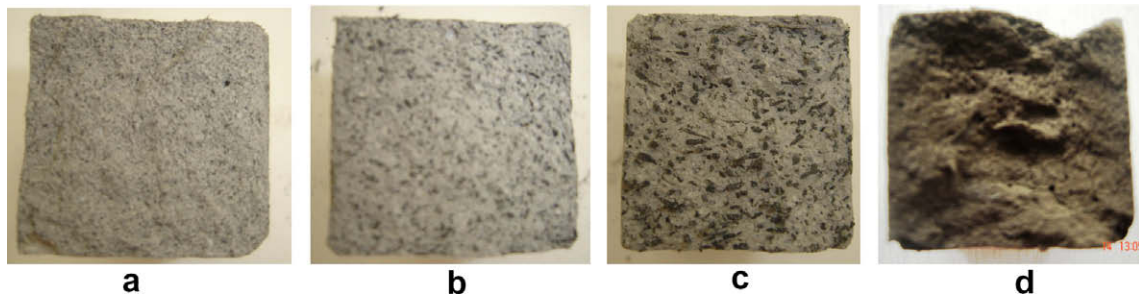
Fracture surfaces of specimens with rubber particles (0–0.25 mm (a), 0.25–0.50 mm (b) and 0.50–1.0 mm (c), in diameter) and specimen without rubber particles (d) submitted to bending stress after failure.
